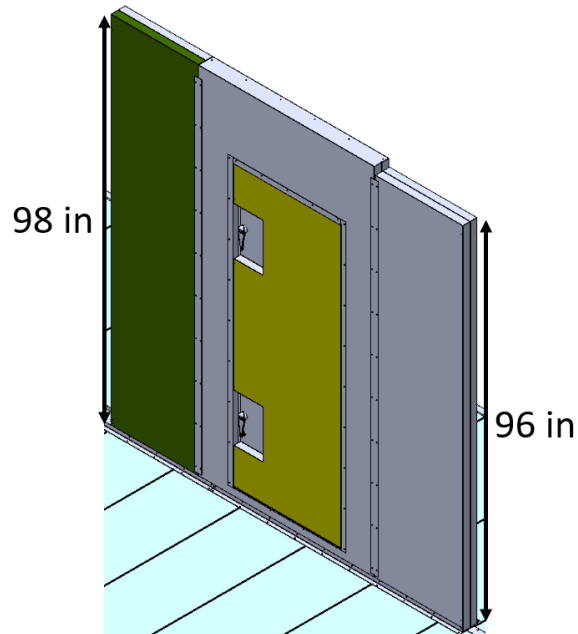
From left to right: 98 in tall internal wall panel, internal wall panel with door, and 96 in tall internal wall panel.
